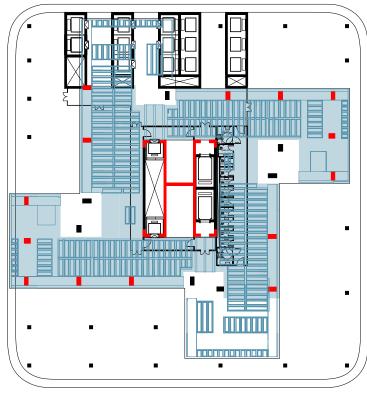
Structural overlay showing the extent of existing slab and structure retained with centralised north core layout
